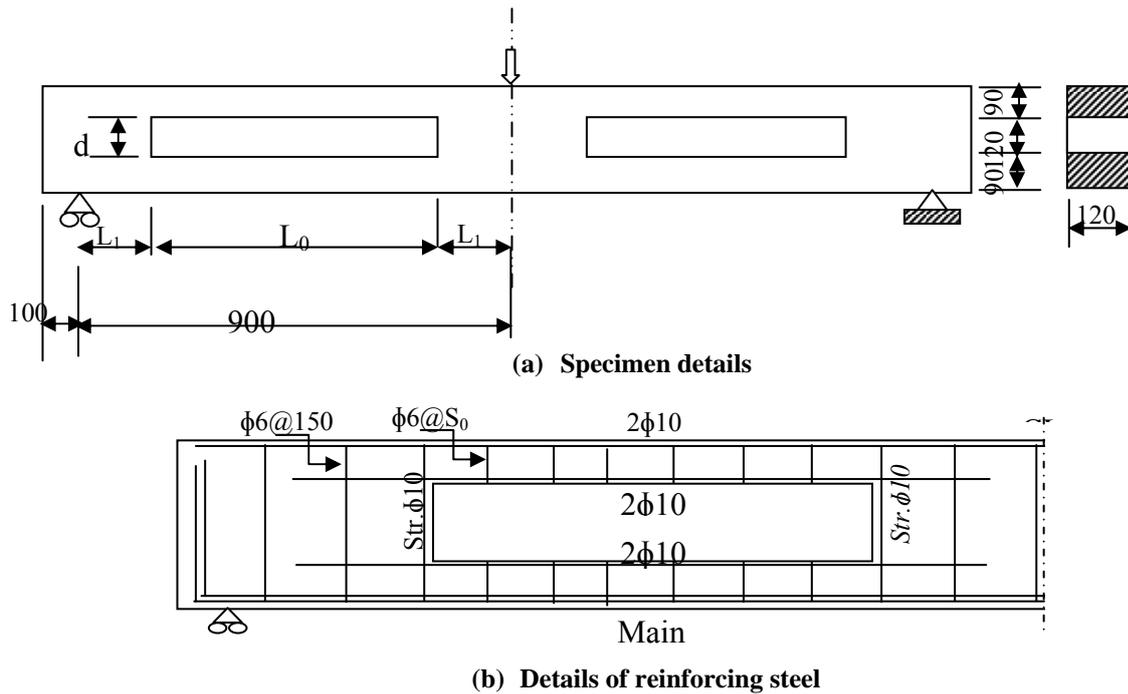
Specimen and reinforcing steel details (Abdul Hafez, 2009)
